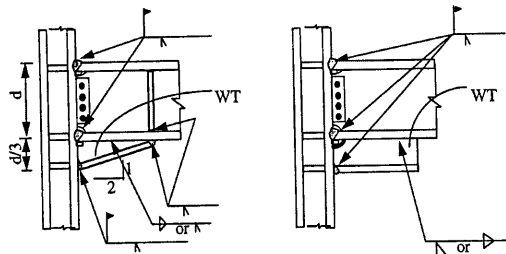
Recommended details of beam-to-column connections strengthened by haunches (after Ref. 6)
